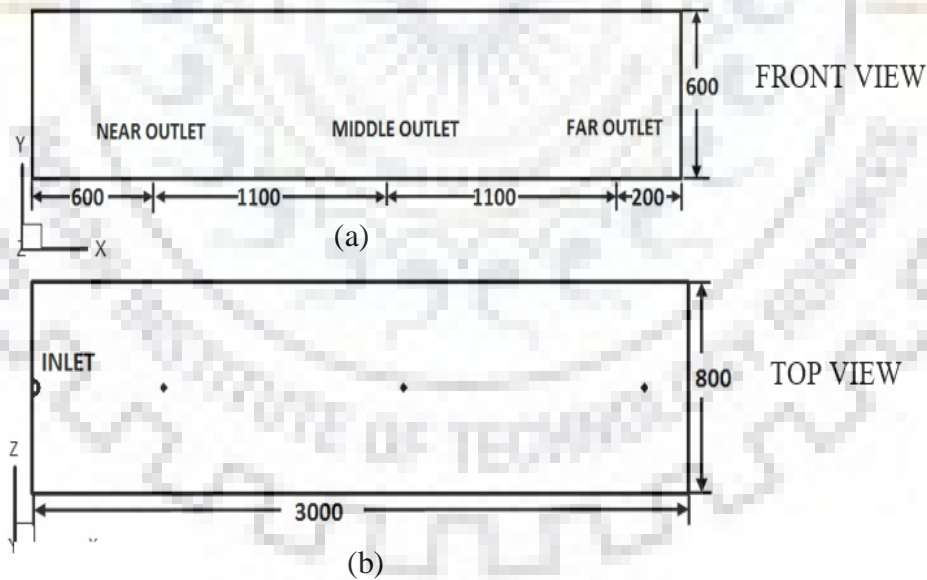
Geometric dimensions of boat shape (a) front view (b) top view
